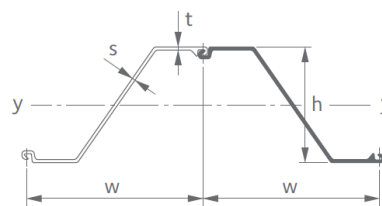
AZ sheet pile geometry (ArcelorMittal Sheet Piling, 2020)
